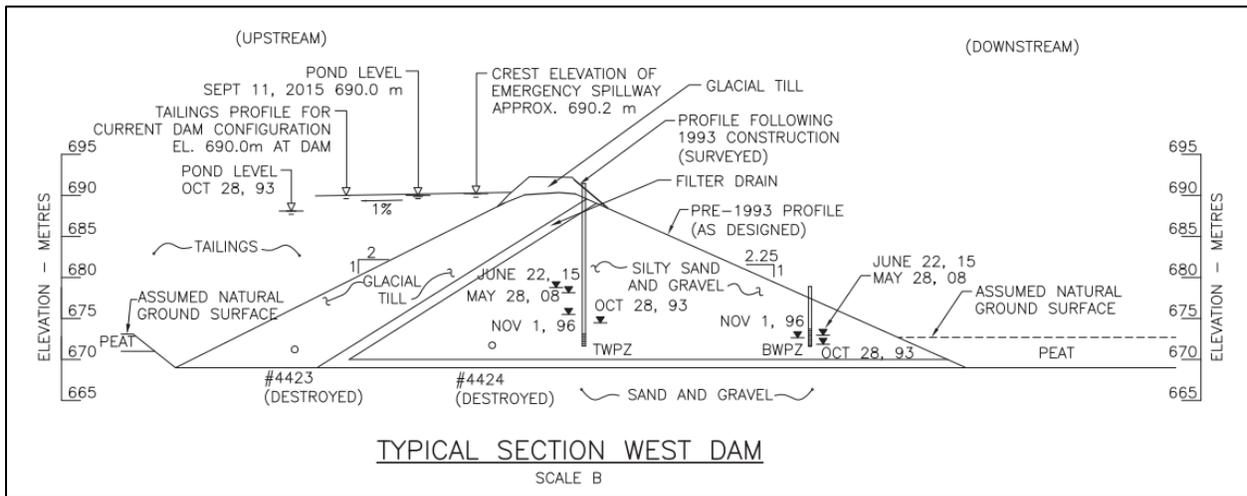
The West Dam at the Goldstream (Revelstoke) mine site is 23 meters high and constructed from compacted earthfill. According to Klohn Crippen Berger (2016), planned dam raises were never completed. The above cross-section confirms that the West Dam is a single-stage dam. Portion of figure from Klohn Crippen Berger (2016).
